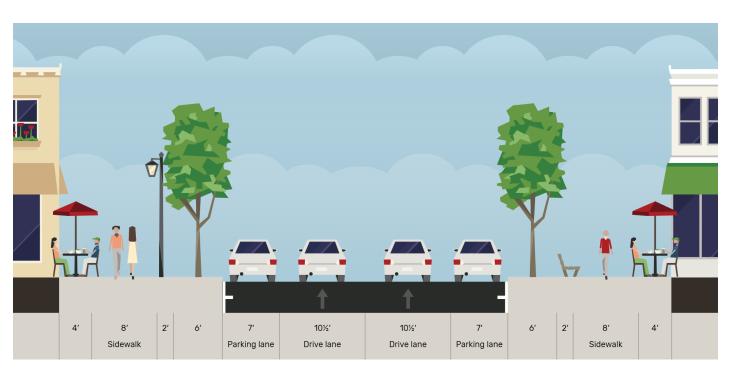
CONCEPTUAL MAIN STREET SECTION
